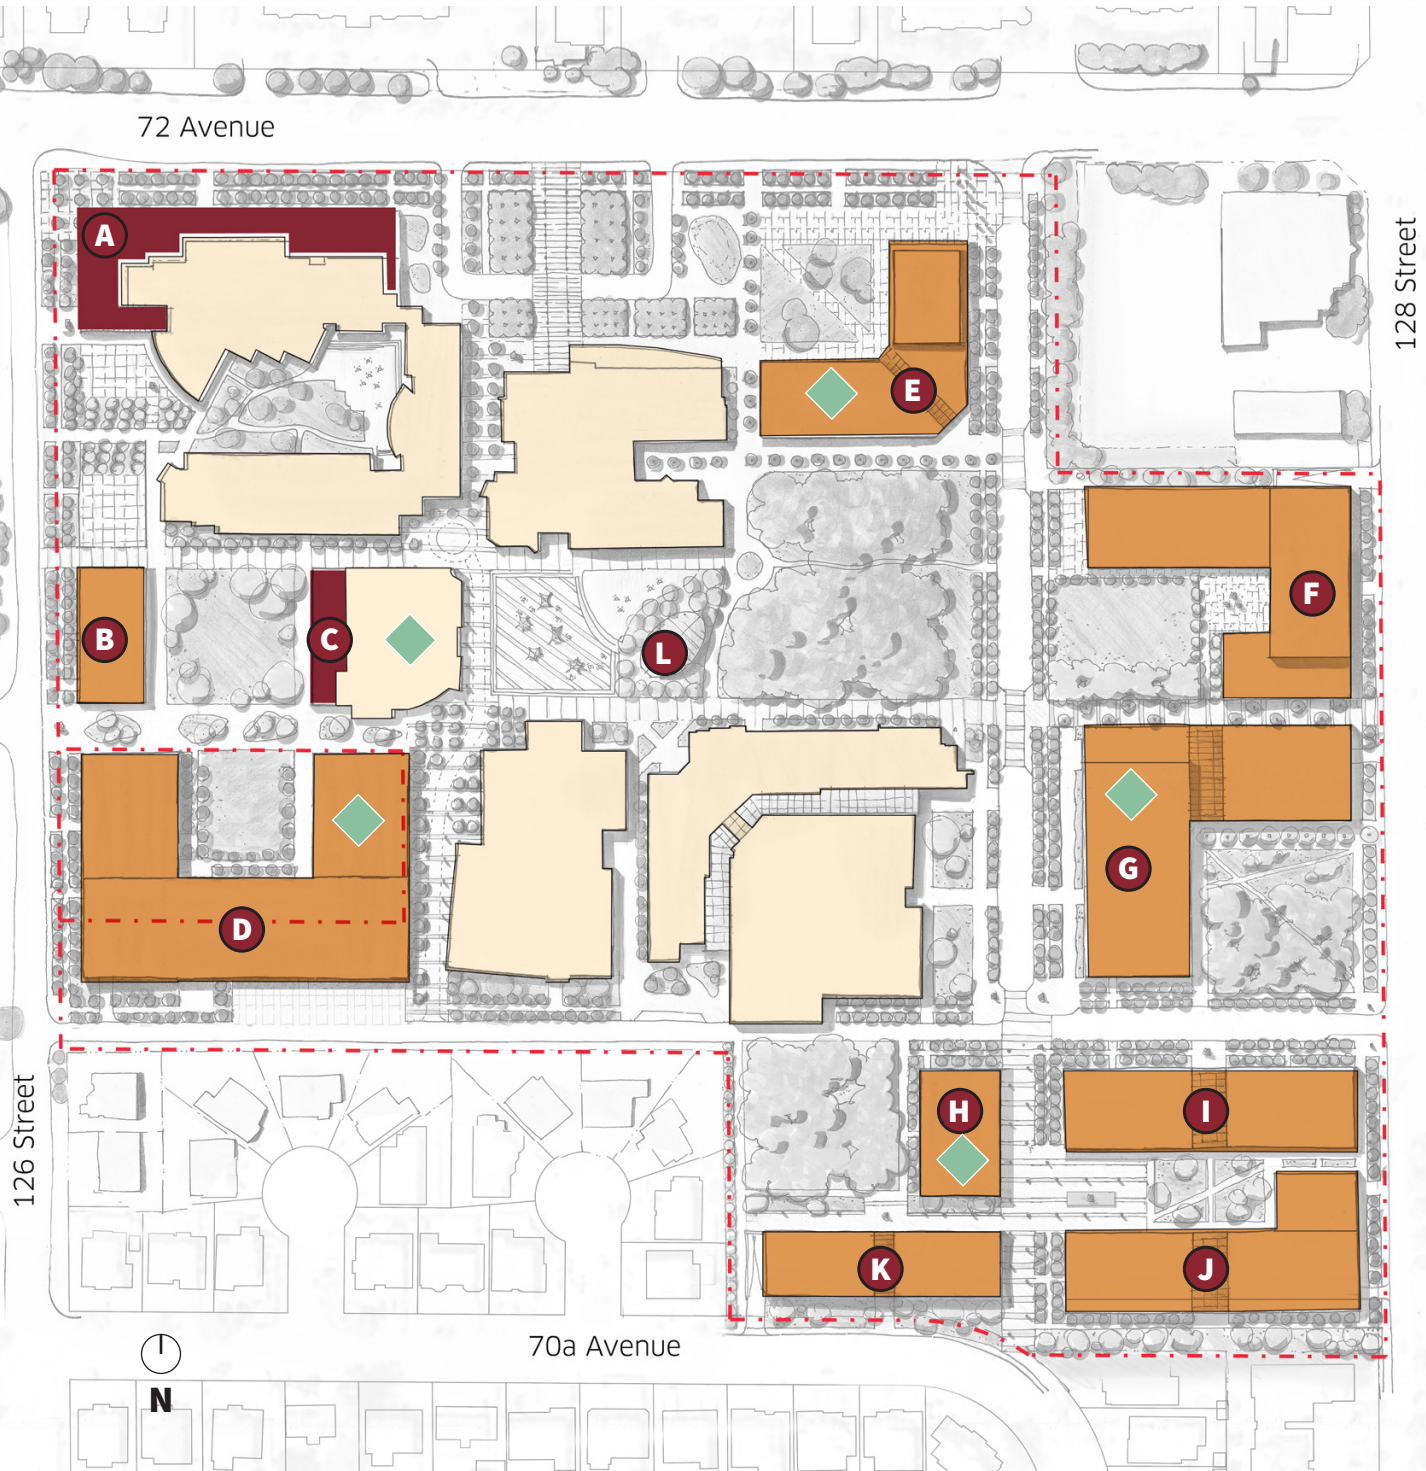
KPU Surrey Existing Buildings, Proposed Buildings, Building Additions
